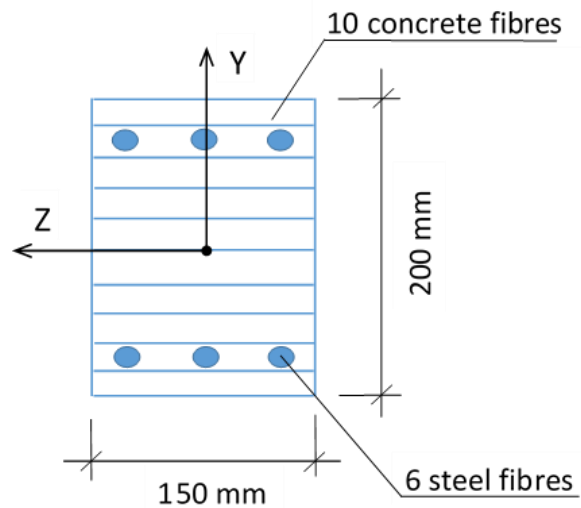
Fibre beam element cross section mesh for specimen H60-10.5-C0-2-
